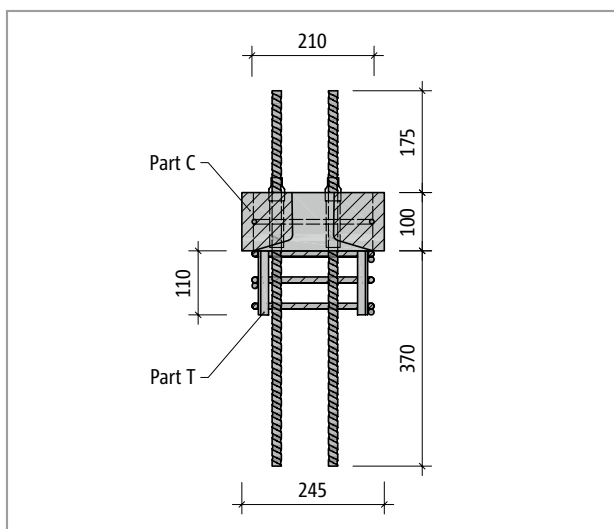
Schöck Sconnex® type P: Product section Part C and part T
